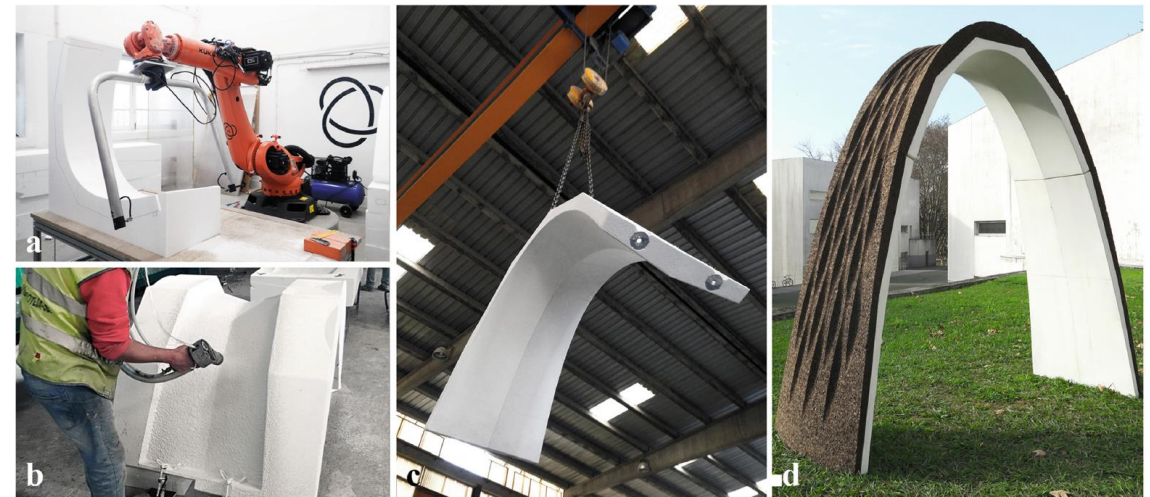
(a) Hot wire cutting of mold with interior ruled surface exposed - center component; (b) GRC spray process after assembled mold – center component; (c) finished GRC center arch component; (d) final assembled Corkcrete Arch.
